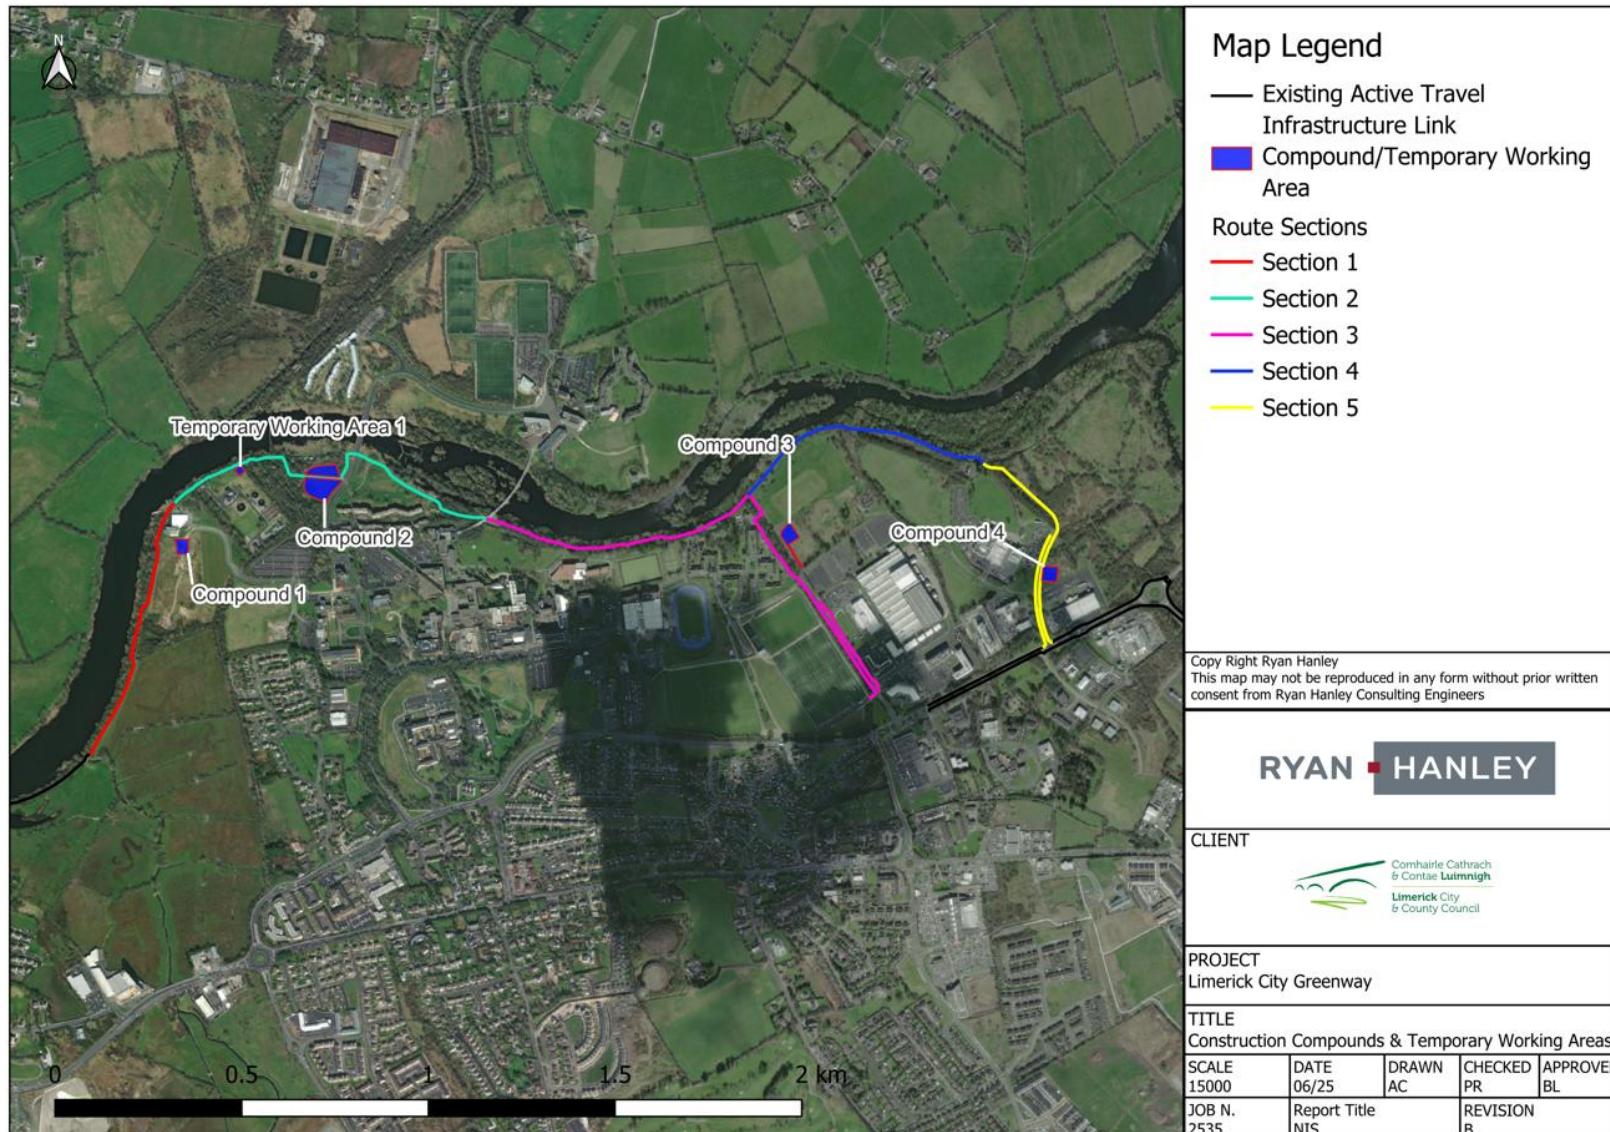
Proposed Sections, Compounds and Temporary Working area
